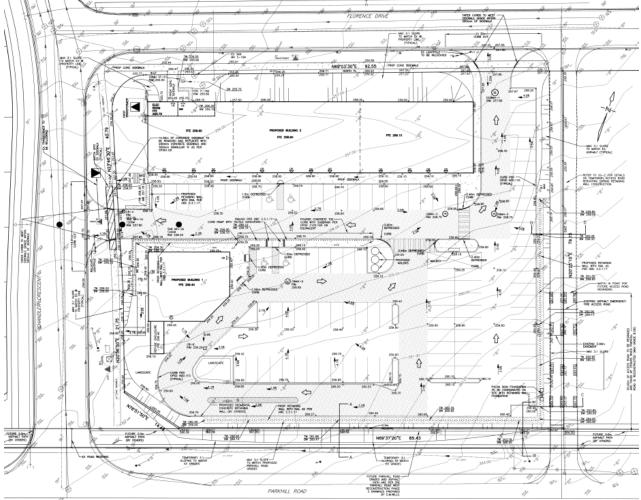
Exhibit B – Site Plan Set of Drawings, Grading Plan, Page 3 of 6
